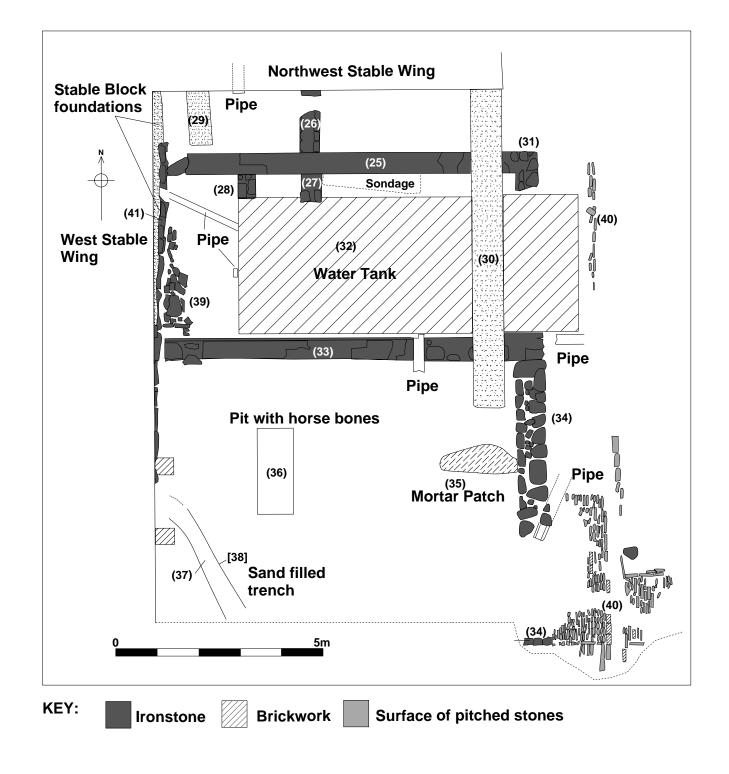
Post excavation plan of northwest corner of Stable Block courtyard
